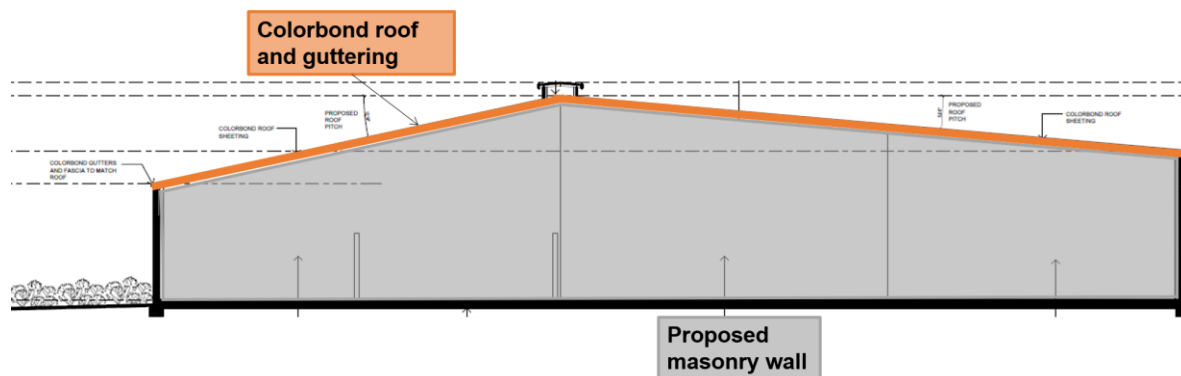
| Proposed plan for the western elevation showing external walls as full-height masonry wall
